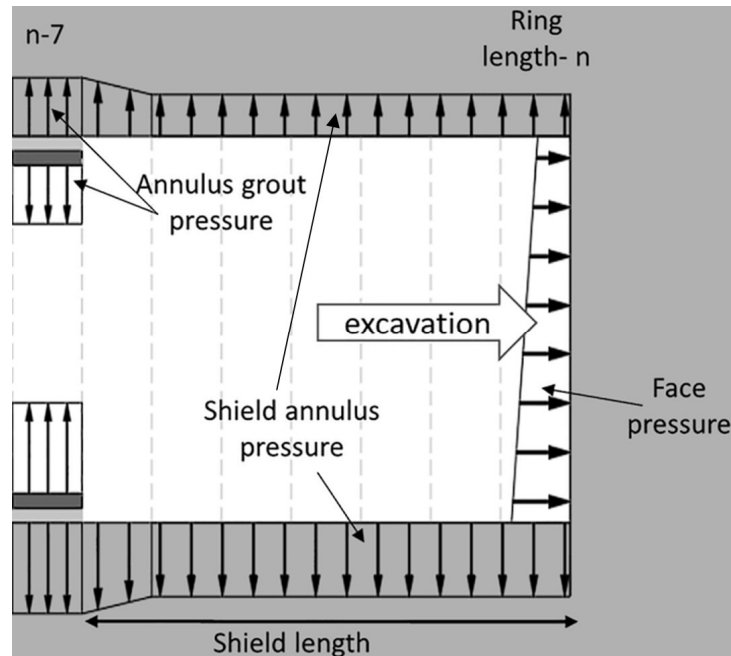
Enforced pressure at the tunnel excavation walls, around the shield, modified from Epel et al. (2021)
